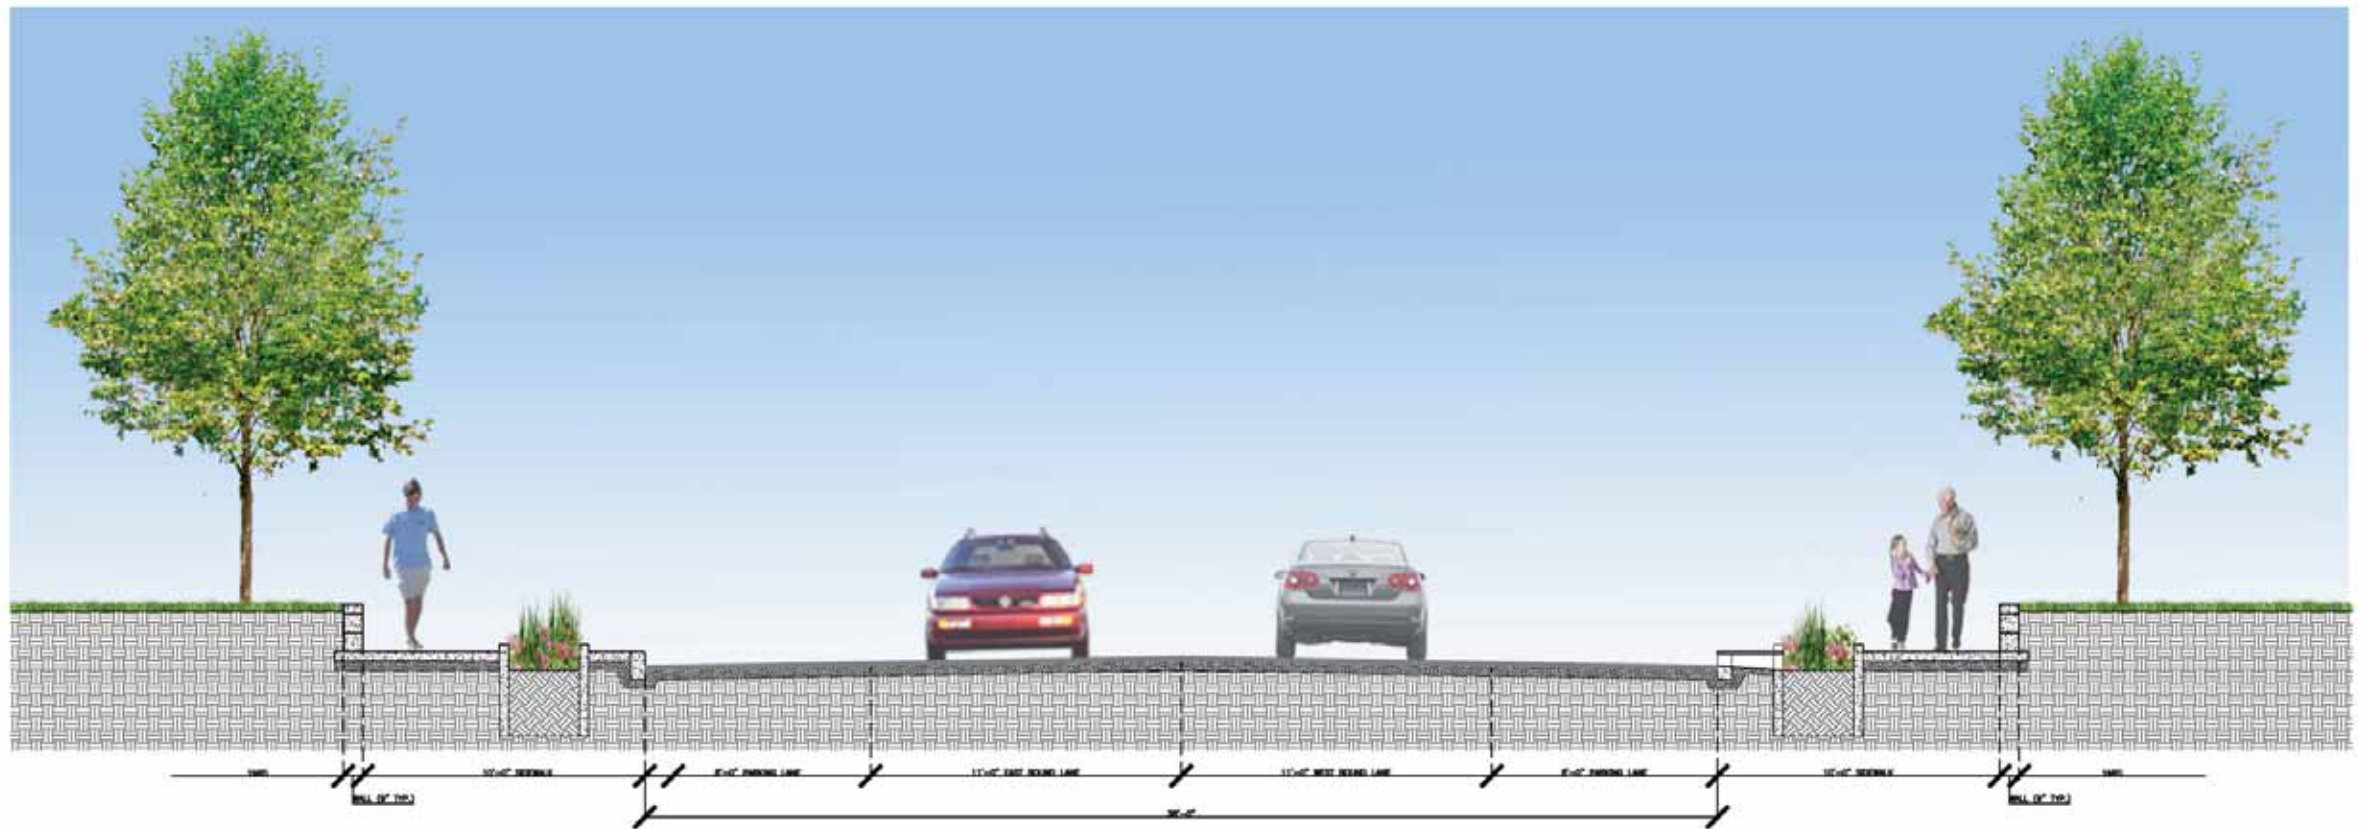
Proposal two, widened sidewalk with water filtration plantings between travel lanes and sidewalk. Roadway consists of two travel and two parking lanes (no turning lane). This design is recommended for areas East of Lee Street. Below, section; opposite, plan.
